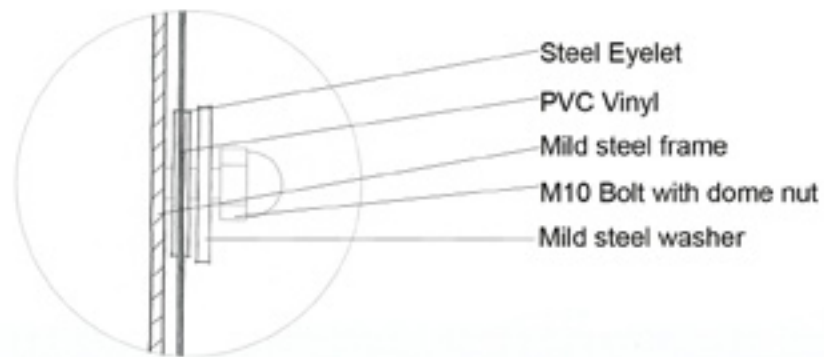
& 244: Sectional exploration into constructing and fixing the sculptures (Author, 2008)
